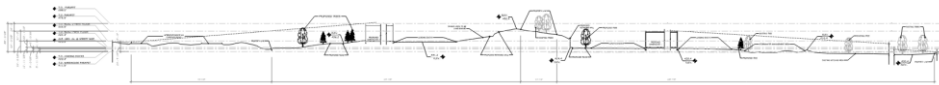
O.32: Site Section Viewshed from Route 84, Vantage Point 9
